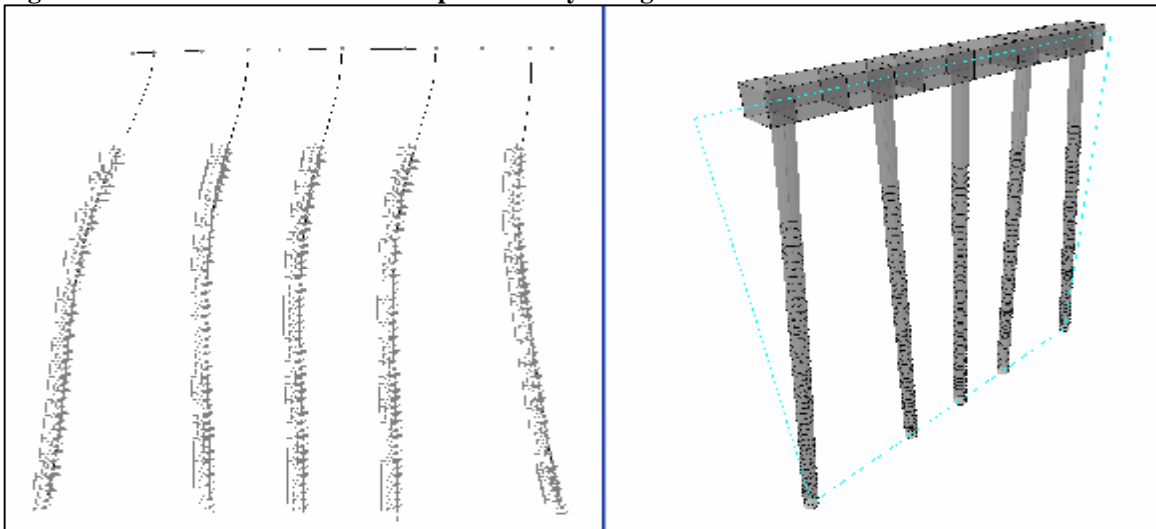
SAP Model—Northampton County Bridge, Deformed and Unloaded Shapes
